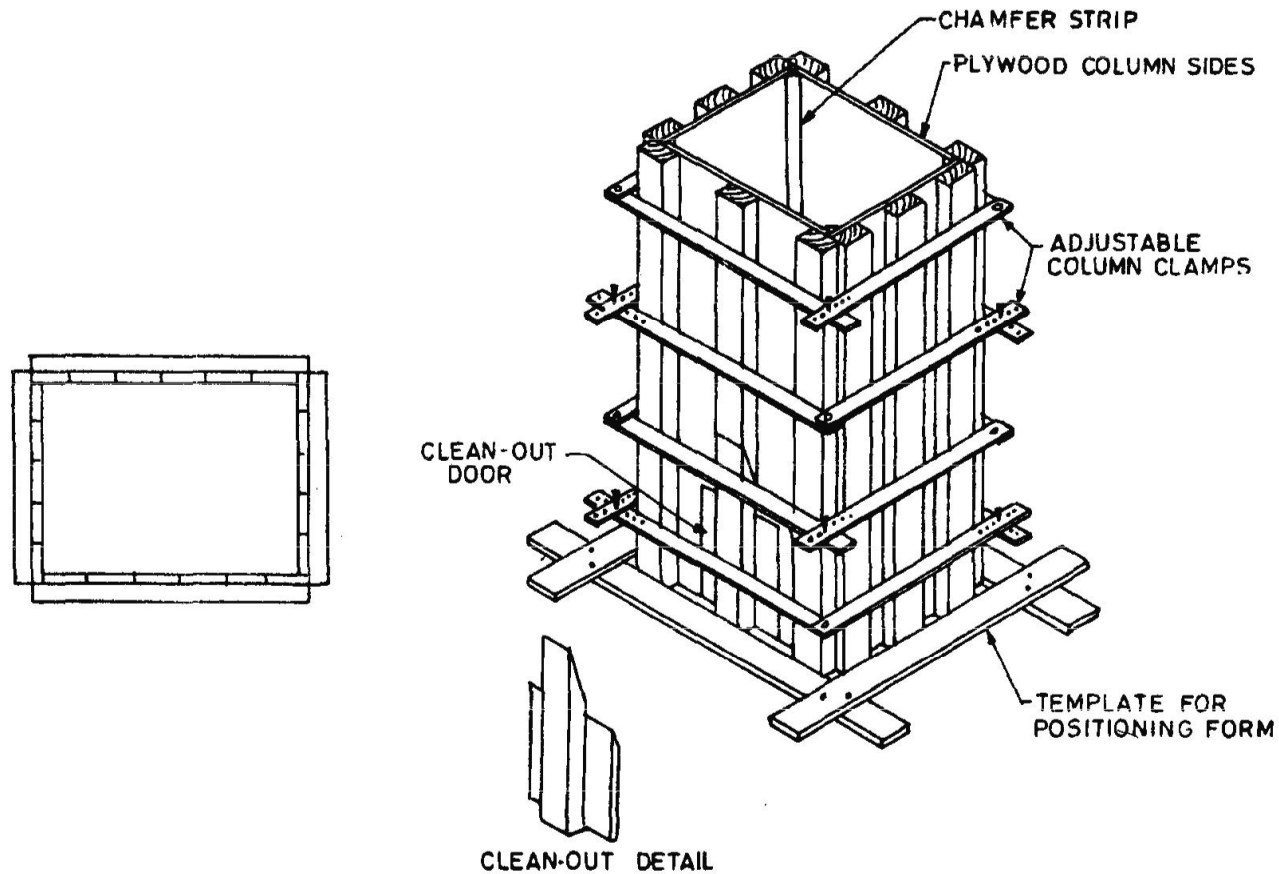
TYPICAL CONSTRUCTION OF HEAVIER COLUMN
